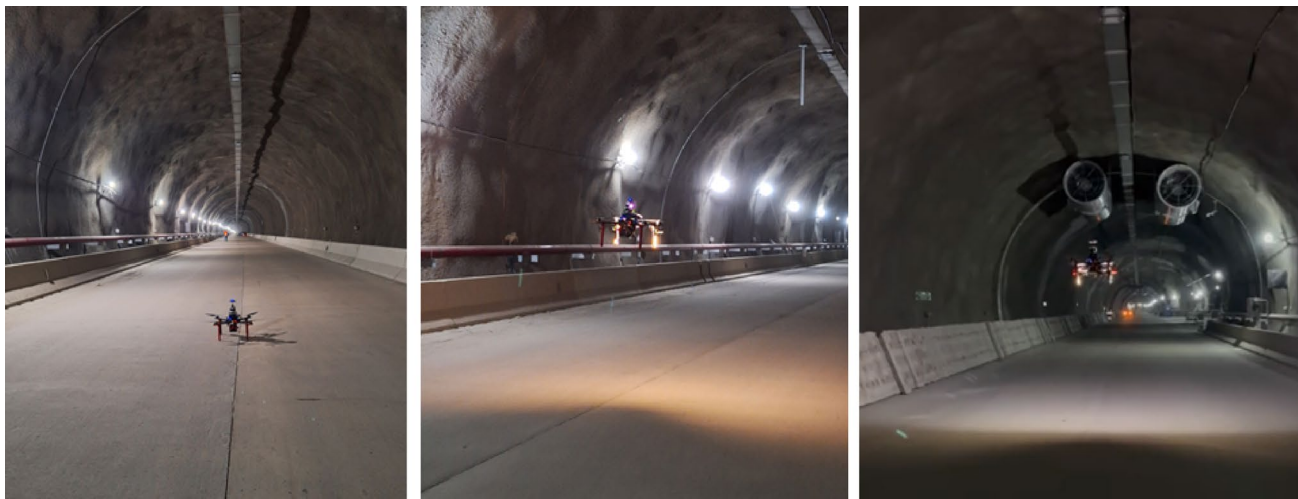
Experiments for underground tunnel reconstruction using photogrammetry
